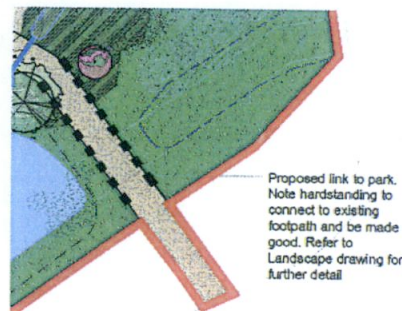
Extract of Site Plan Showing Connection to Griffeen Valley Park
